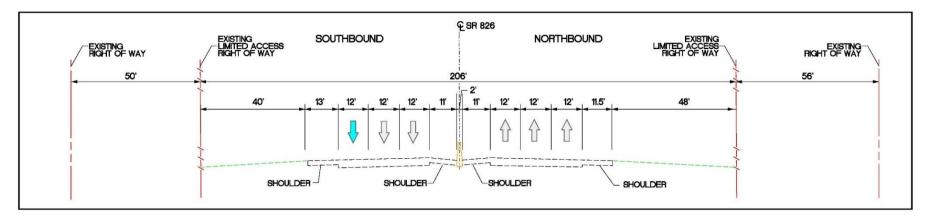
1: Existing Roadway Typical Section between US 1 and SR 874
